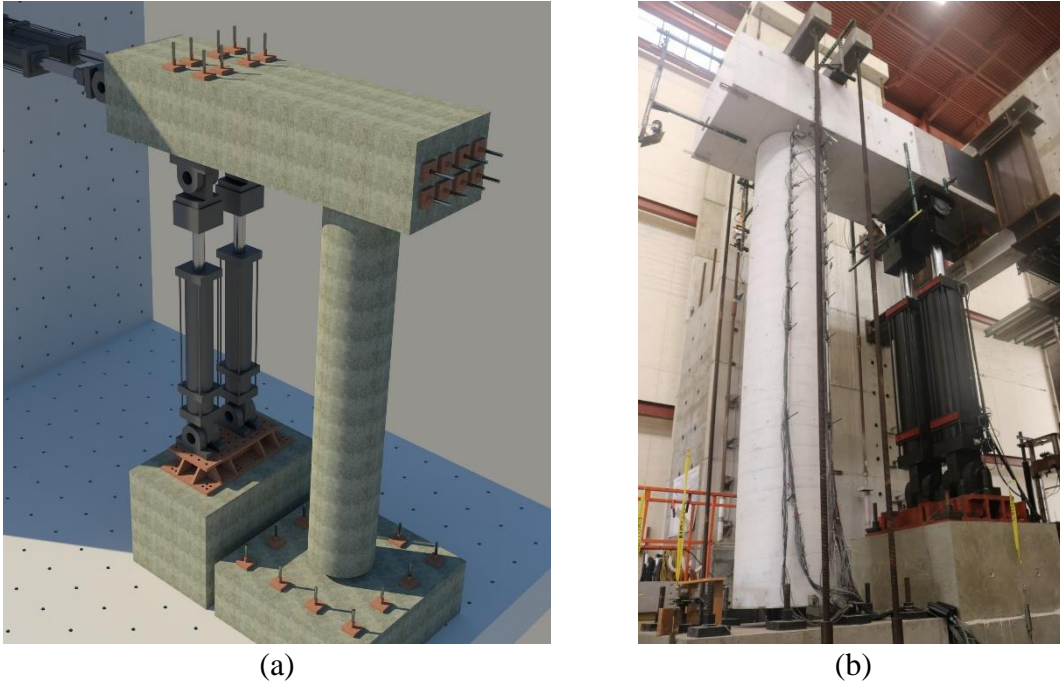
Overall Elevation View of Test Specimen: (a) 3D Rendering; (b) As Built Specimen
